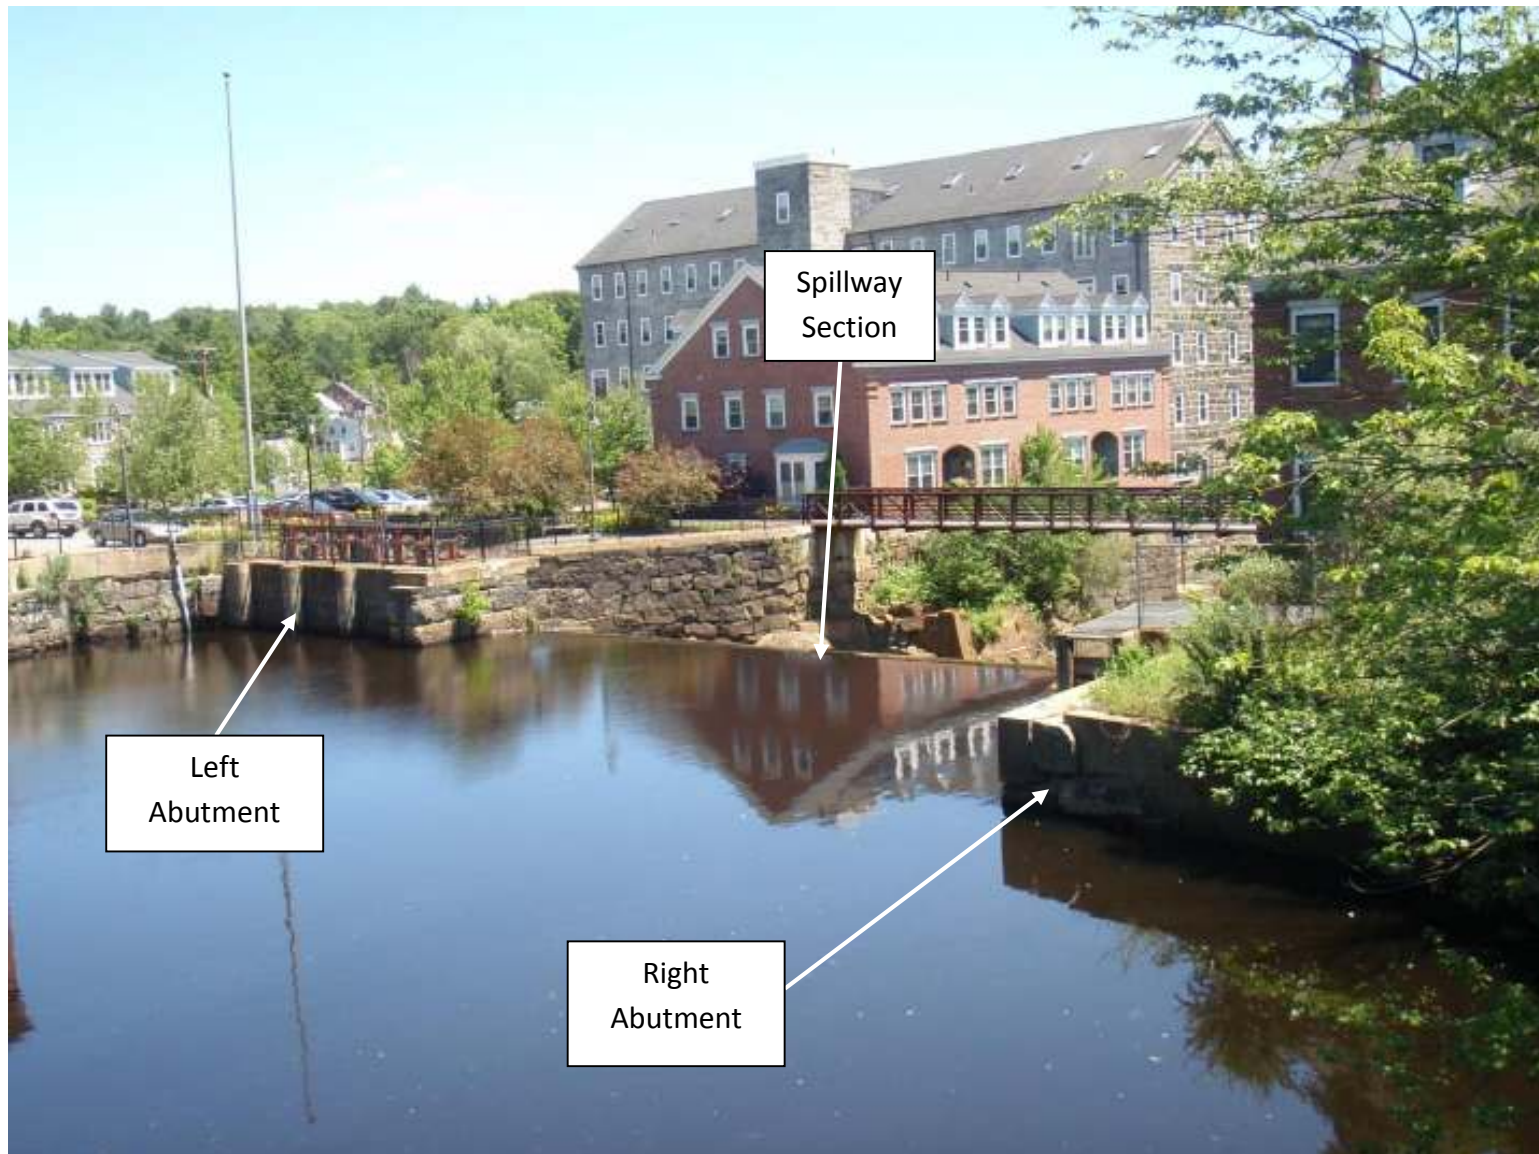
Looking downstream toward Macallen Dam's left abutment, right abutment and spillway sections. Photo taken July 2012.
